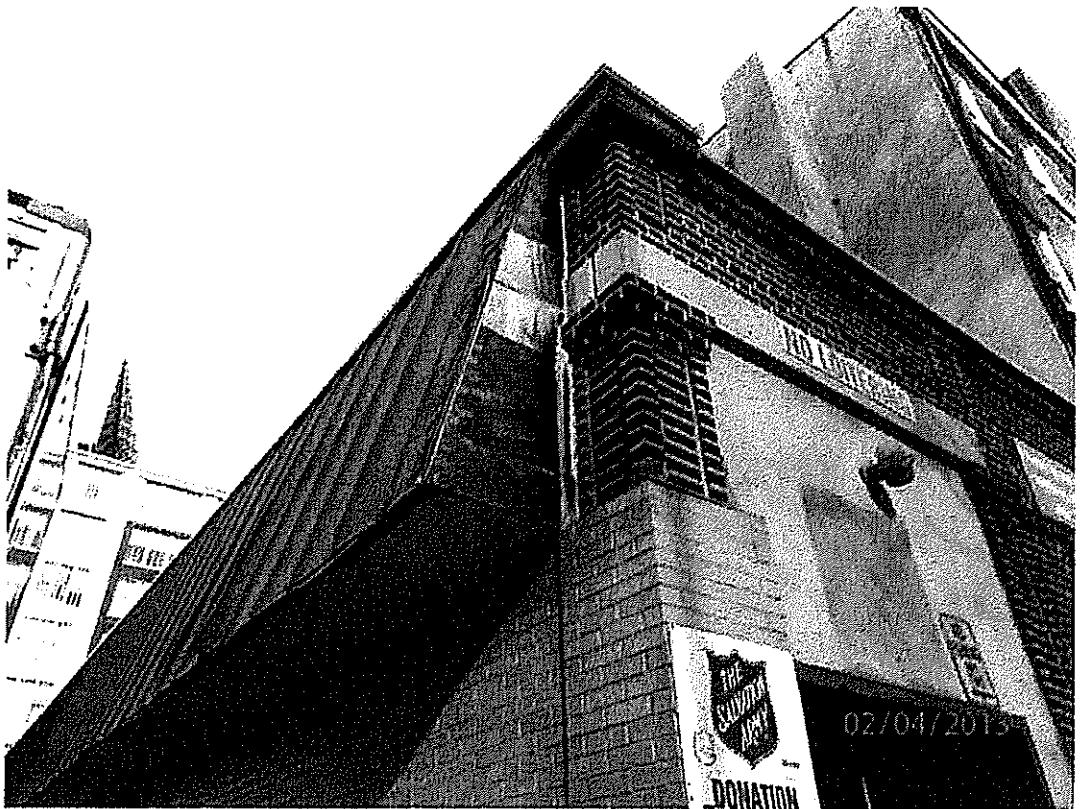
Façade Detail 2140 Market Street, Philadelphia, PA
